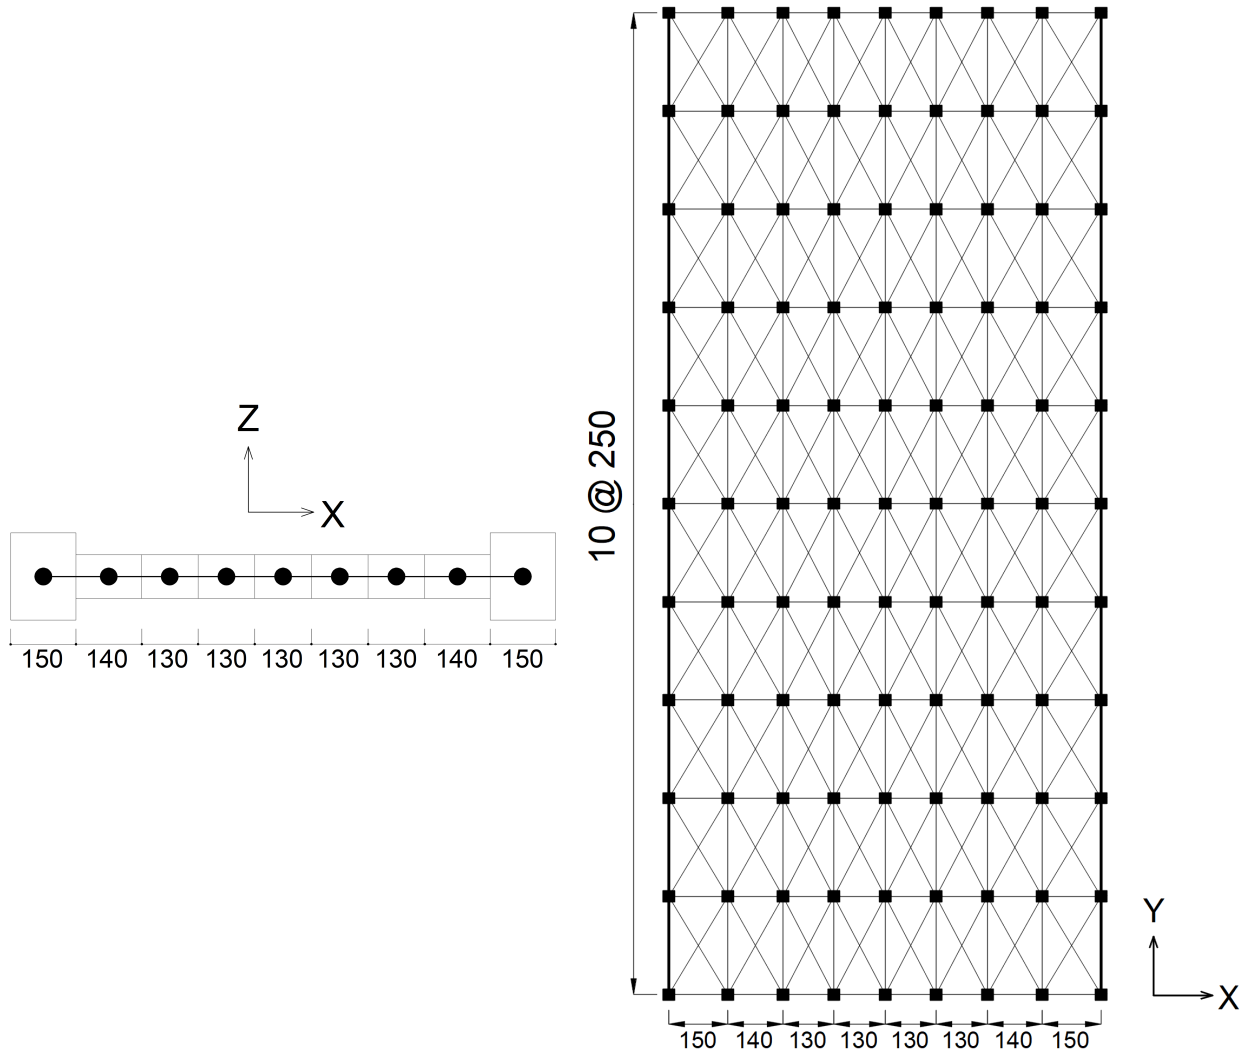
Plan and elevation views of the beam-truss model for Unit 2.0 [Unit: *mm*].
